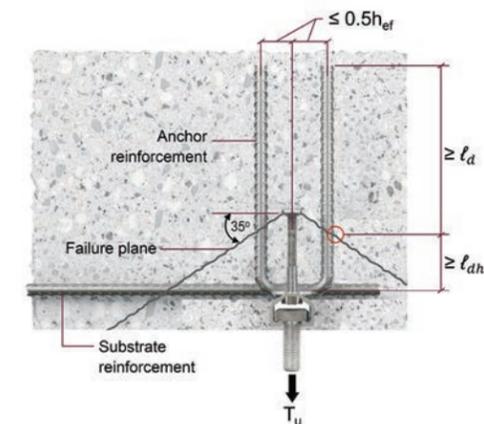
Arrangement of anchor reinforcement for anchor channels loaded by tension load at an edge.
